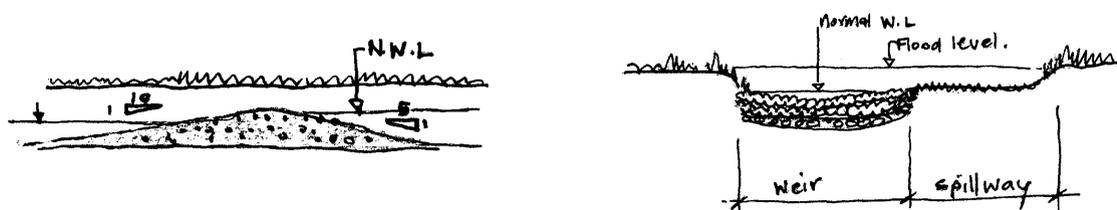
The longitudinal section (left) and cross section (right) through the proposed new weir on the outlet of Lake Ngaroto. The downstream face of the weir (left-hand face) will have a slope of 1:10, and the upstream face (right-hand face) will have slope of 1:5.
